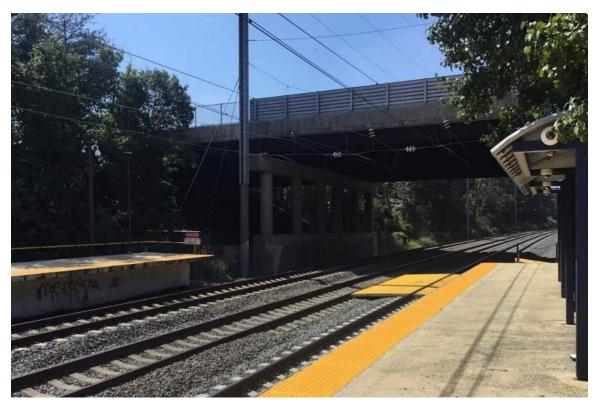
of 11: Bowie State University Station and Laurel Bowie Road Bridge, looking south.
